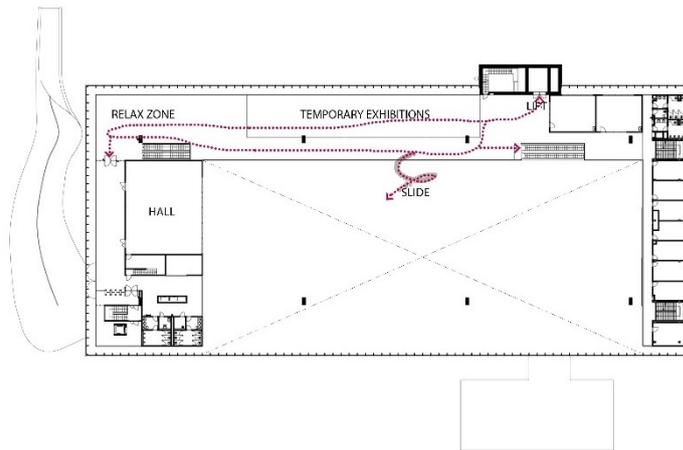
VIDA! Science Centre in Brno, Czech Republic: 1st Floor. (Source: Floor plan by K4 with markings by Filová, 2021)
